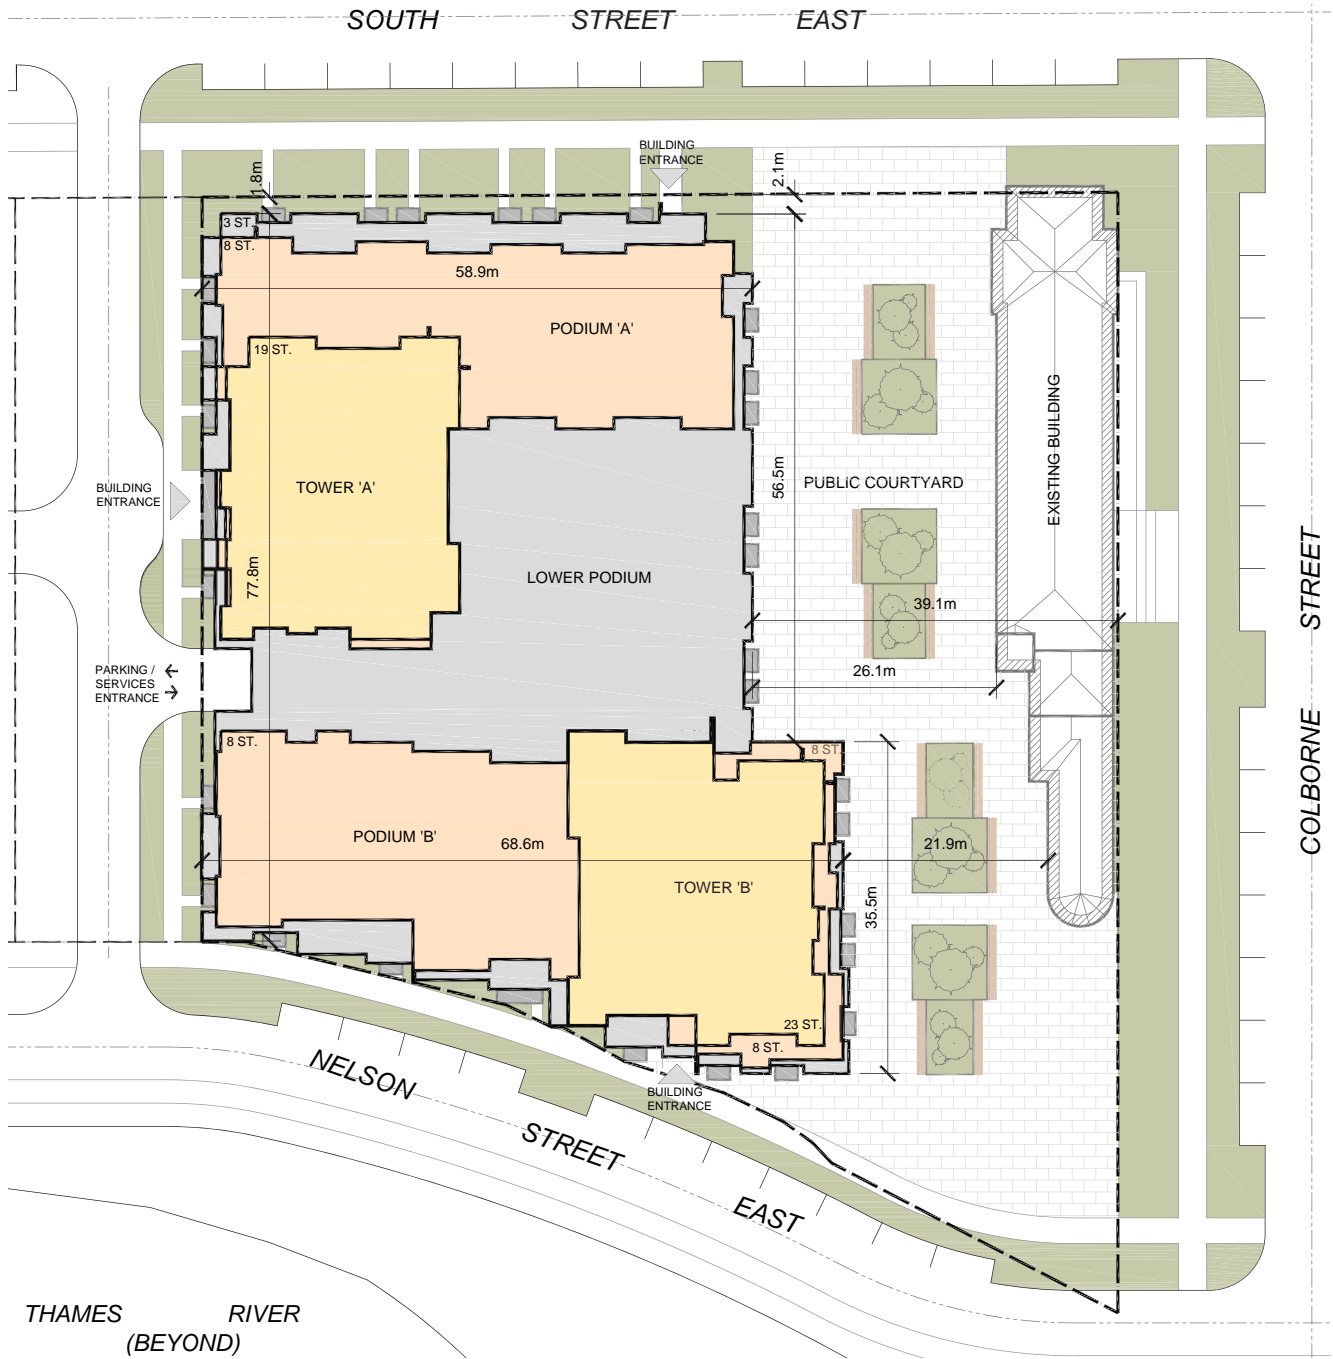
Proposed site plan of residential towers with lower and upper podiums to be located to the west of existing Colborne Building with connecting public courtyard, provided by Medallion Developments.
